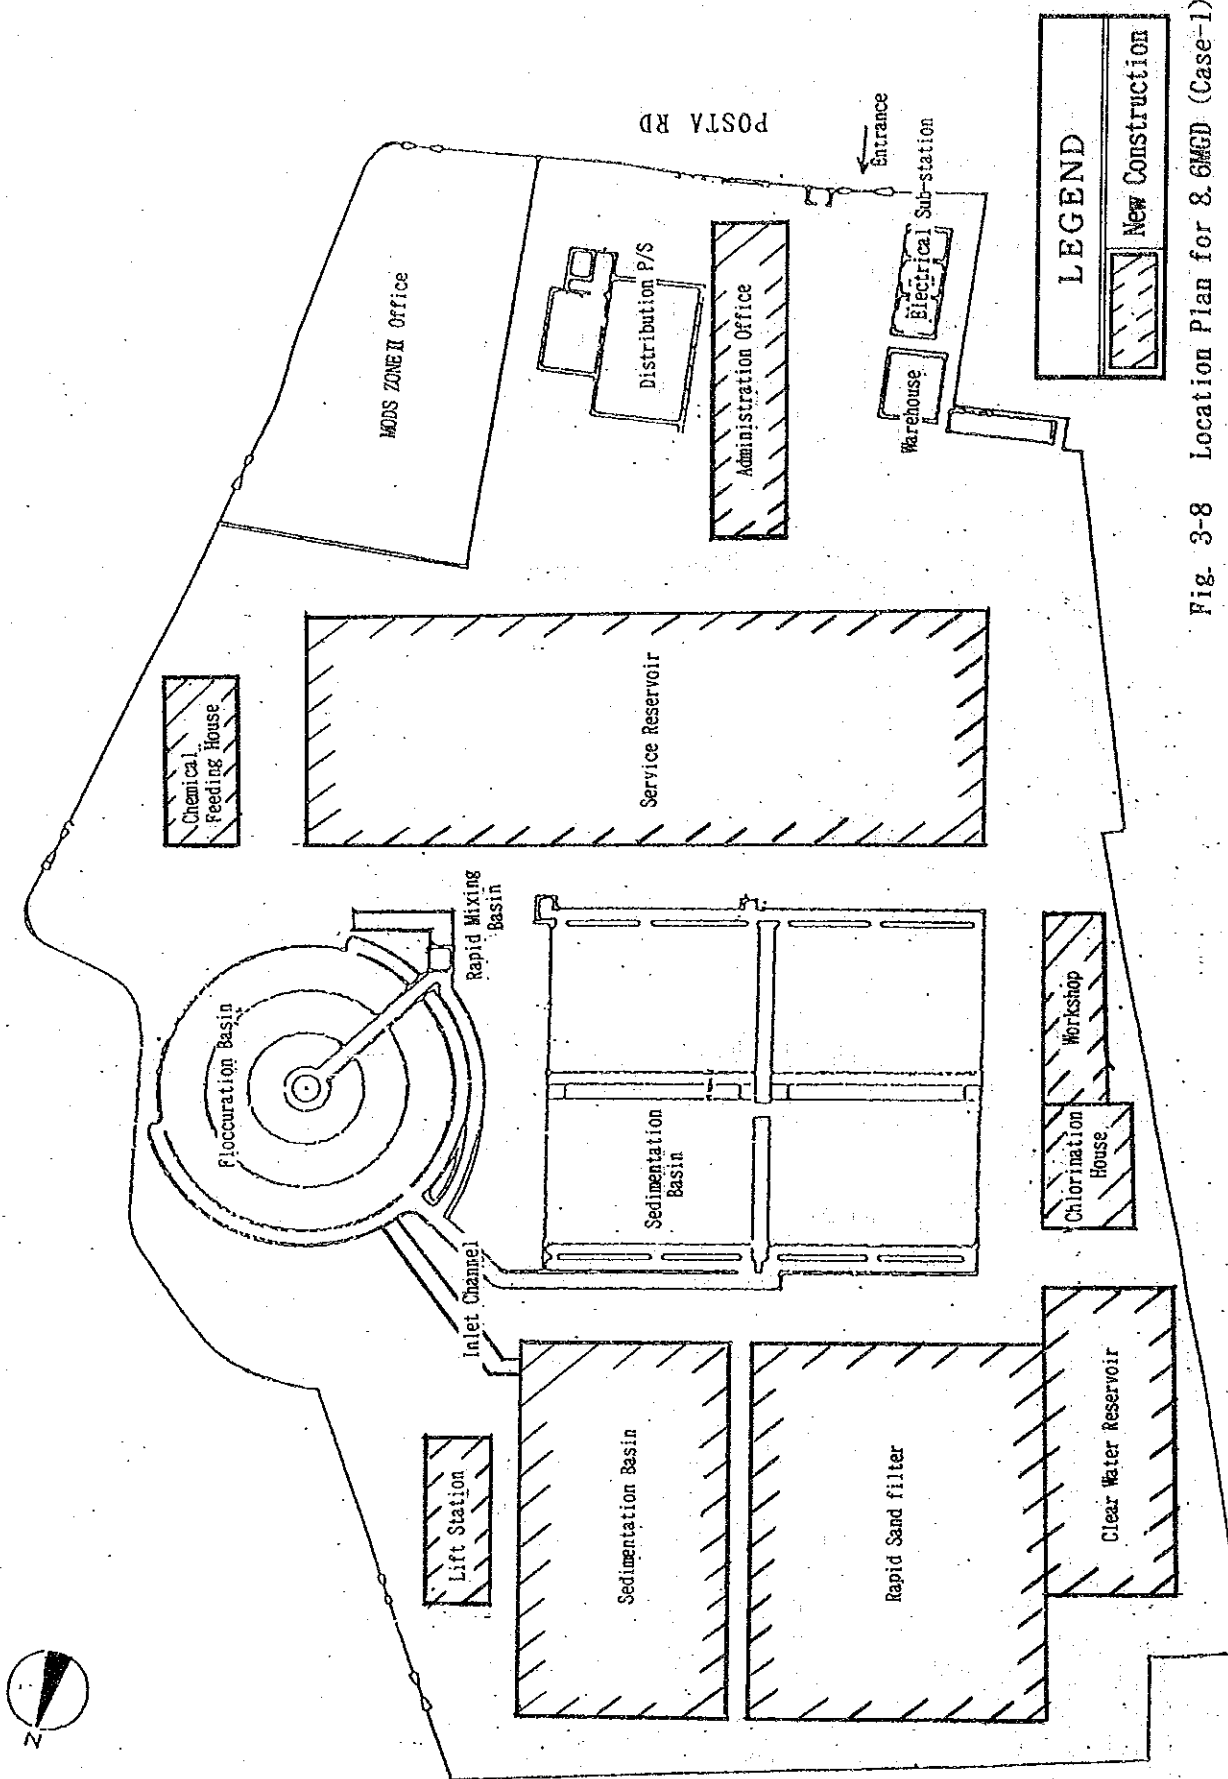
Location Plan for 8.6MGD (Case-1)
